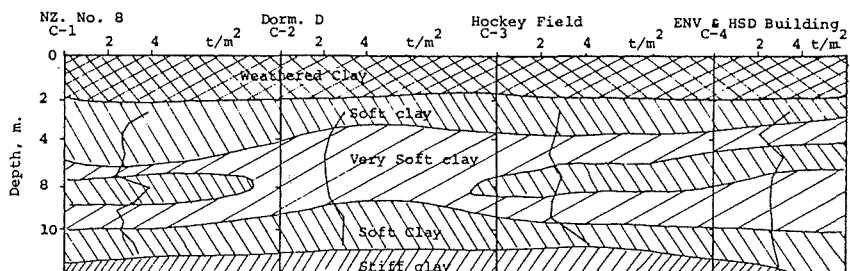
Vane Shear Strength Subsoil Profile Along Line C (see Fig. 1)
